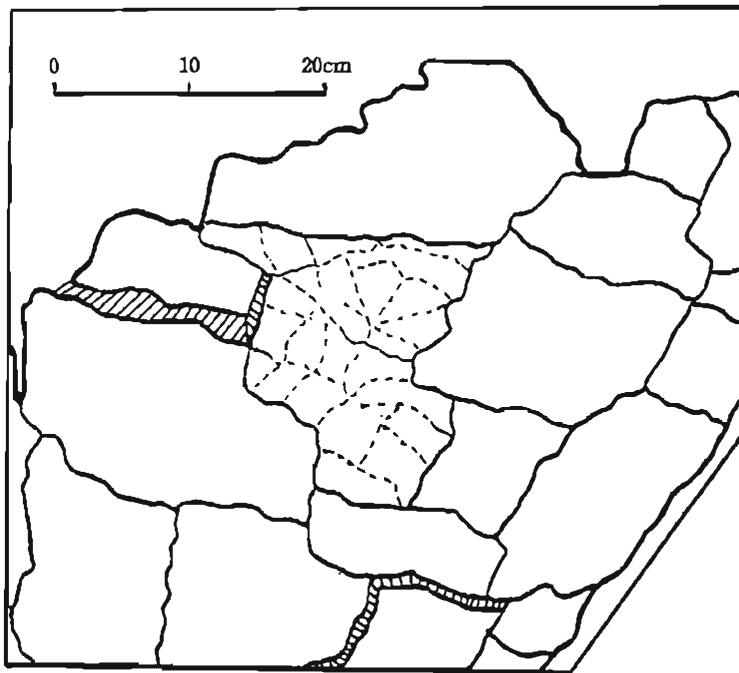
Sketch of the Polygon Cracks Formed on the Joint Surface
